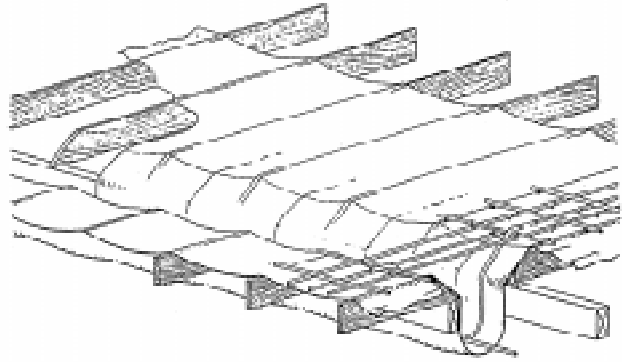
Schematic drawing showing shoring beams and fabric membrane used to form integral slab and beam.
